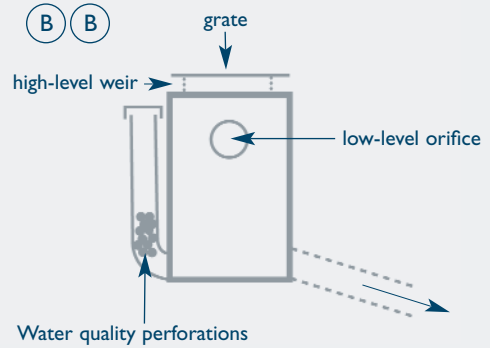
Stormwater Retrofit in Highway Right-of-Way
